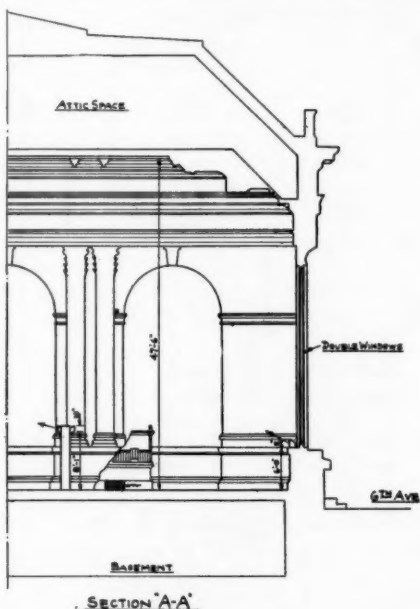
SECTIONAL VIEW SHOWING AIR OUTLETS
